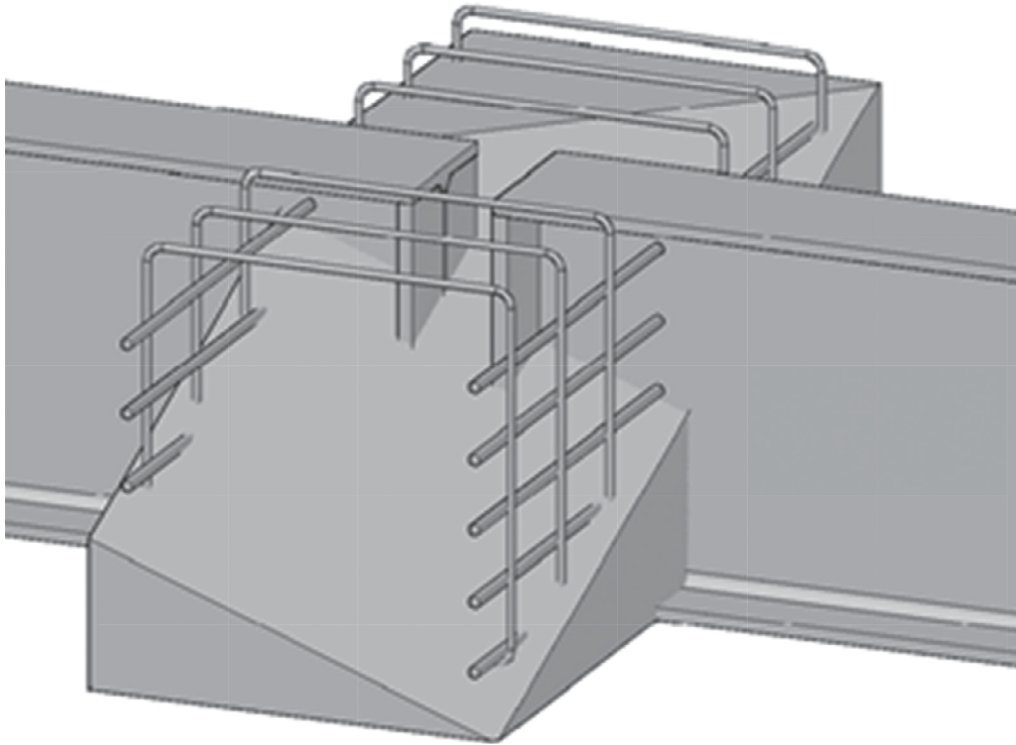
A partial schematic of the steel reinforcement in the concrete diaphragm.
